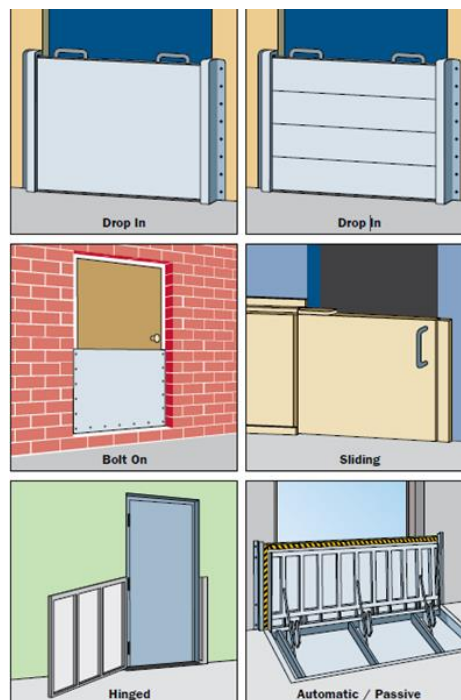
common types of dry-flood proof shields. (source: adapted from (FEMA, 2021)
